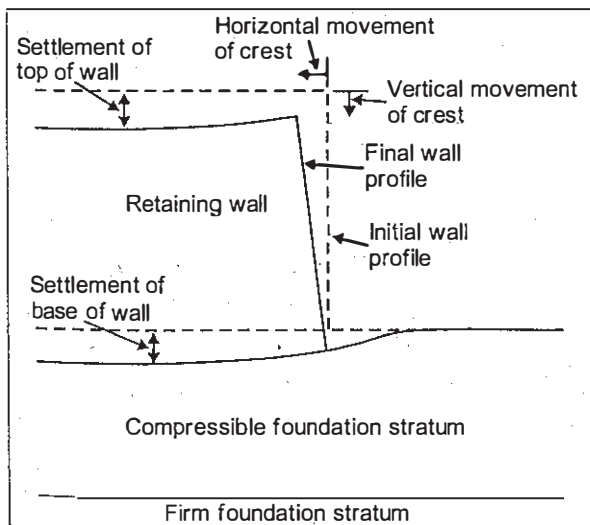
Types of retaining wall deformations arising from compressible foundations.
